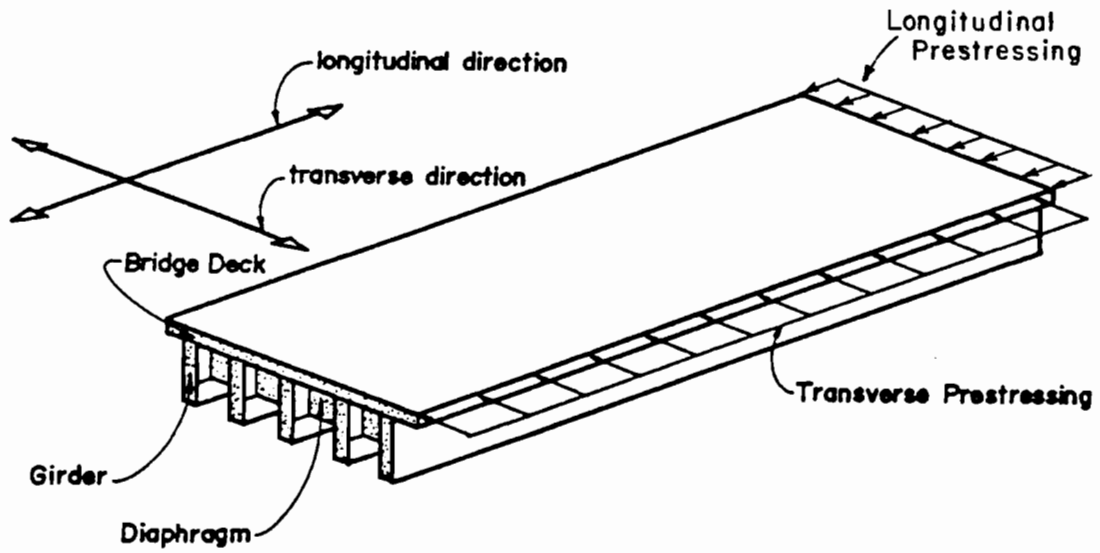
Deck prestressing of a conventional slab-girder bridge
